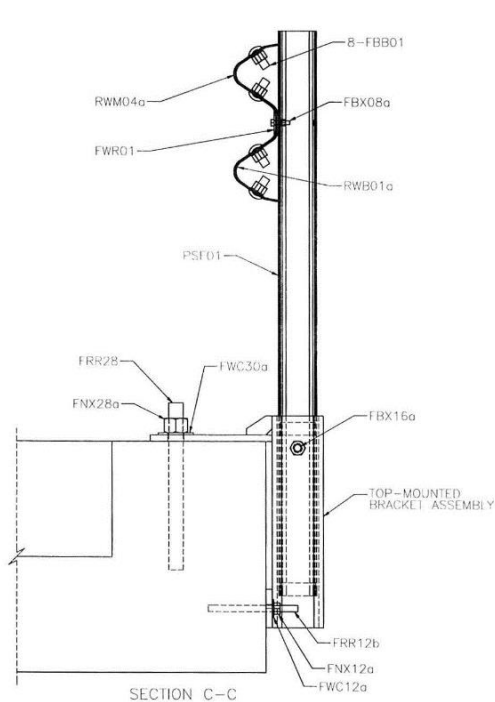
Top-Mounted Guardrail (FHWA Ref. B-262)
